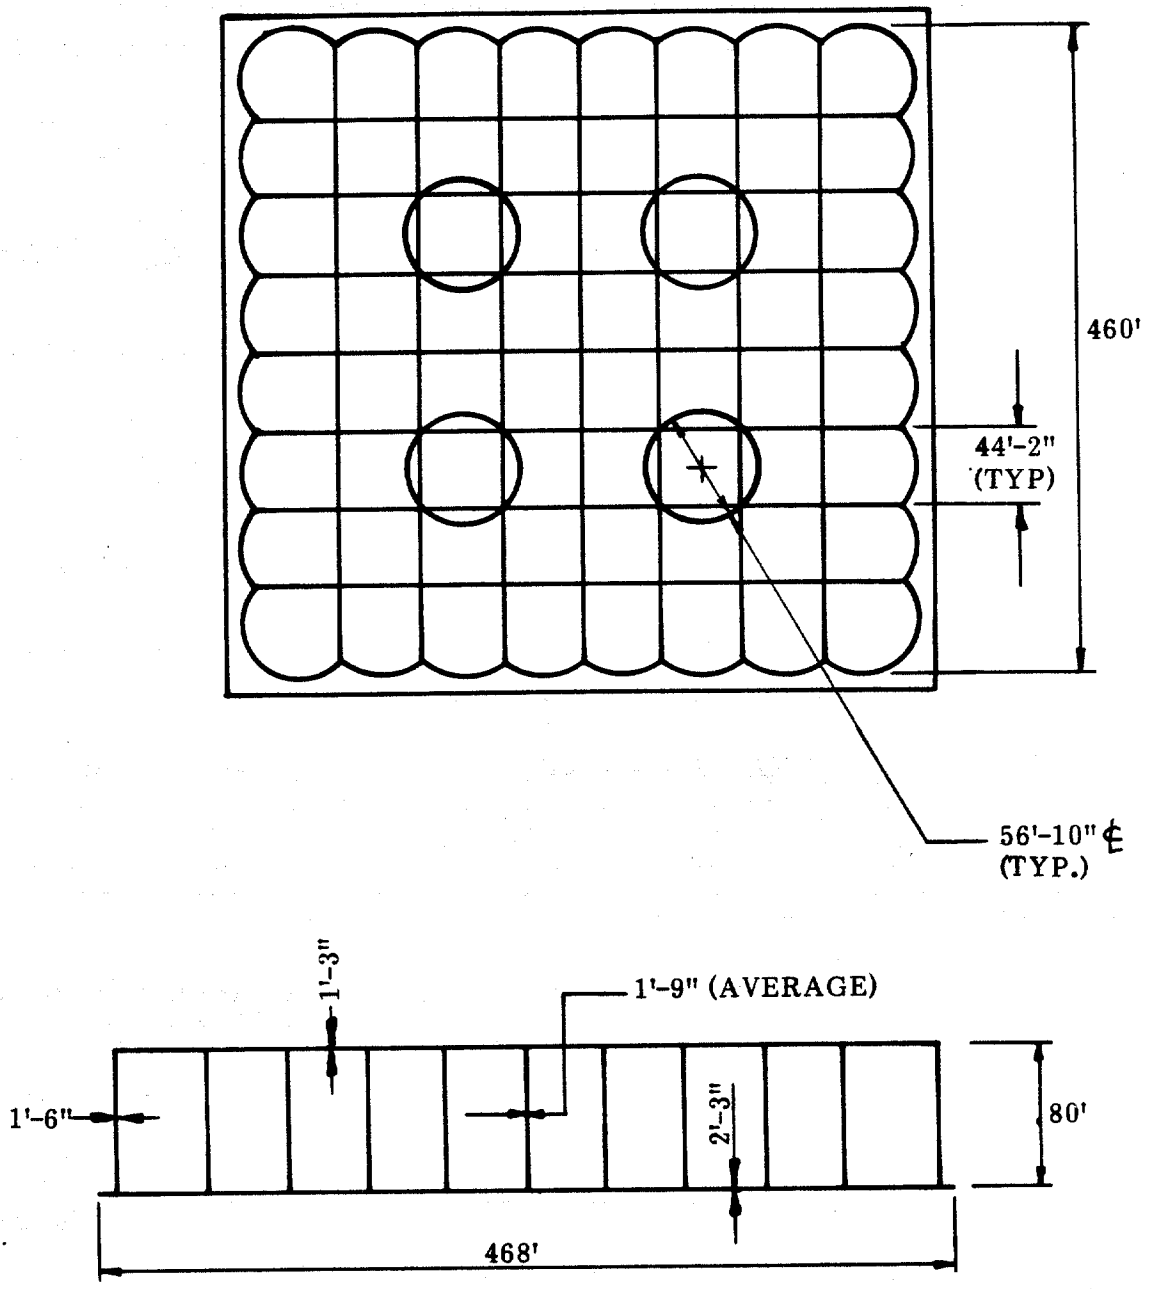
CAISSON DETAILS FOR 150 FT WATER DEPTH CONCRETE GRAVITY PLATFORM
